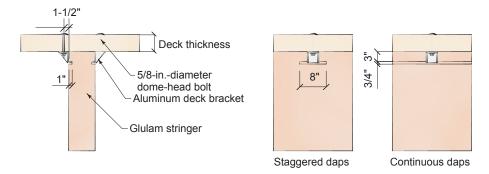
Glulam stringer bridge deck to stringer details: aluminum deck bracket.
